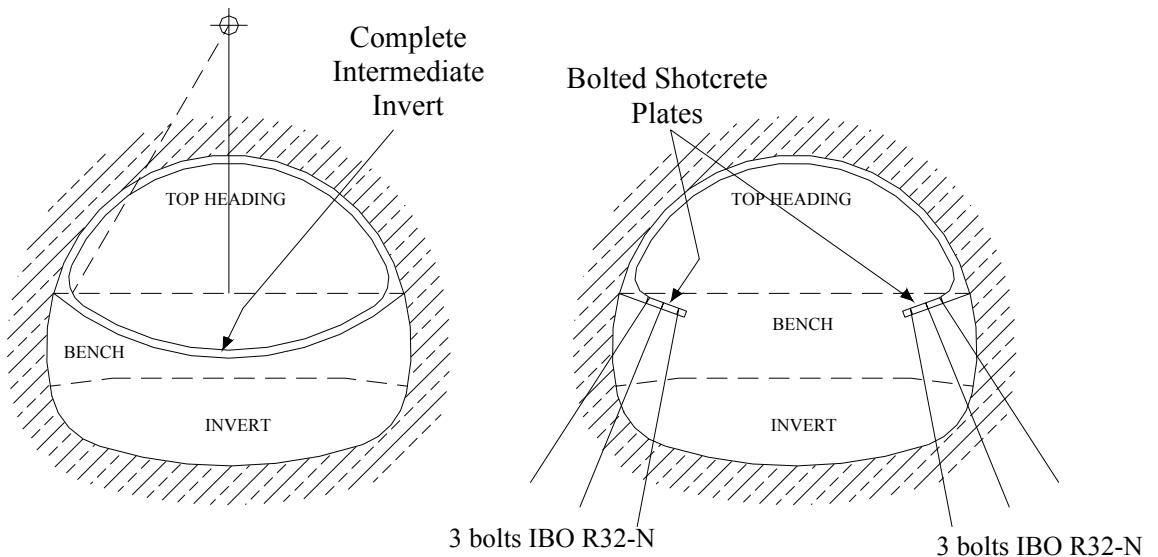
Complete Intermediate Invert and Bolted Shotcrete Plates (Astaldi, 2004)
